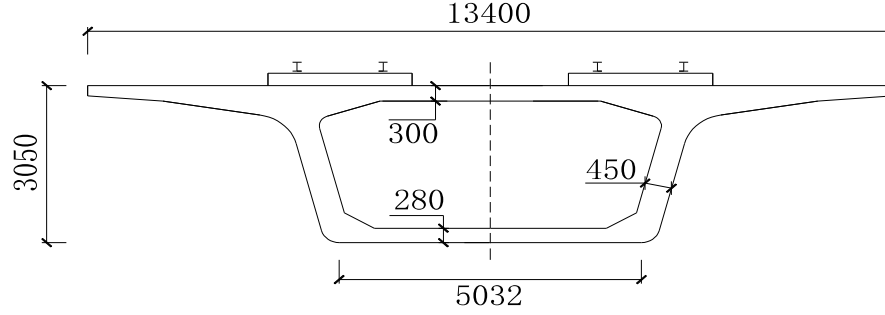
The dimensions for the box girder section (unit: *mm*)
